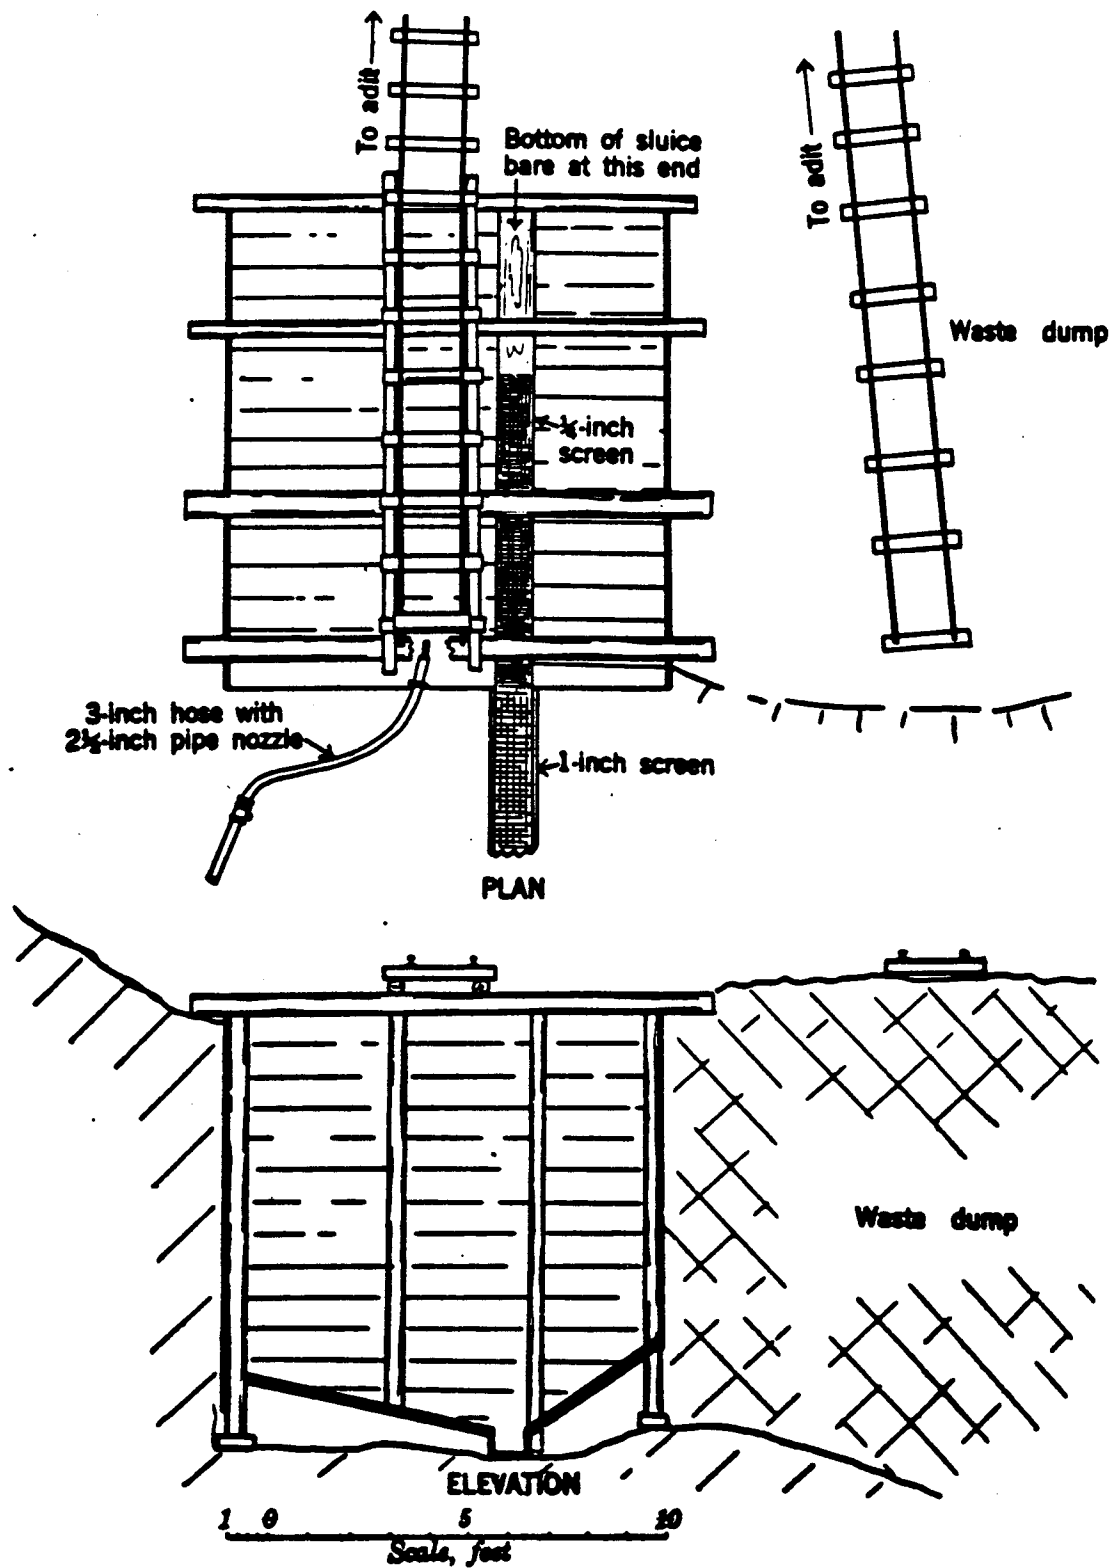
Washing plant, Baker Divide mine, Michigan Bluff, Calh.
